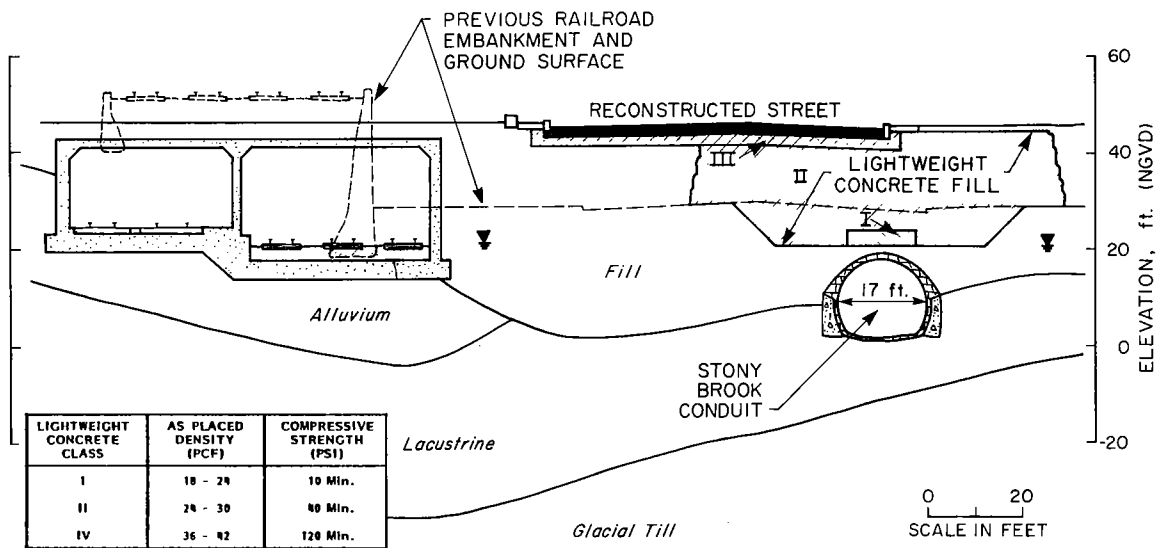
Use of Lightweight Concrete Fill to Minimize Load on the Stony Brook Conduit
